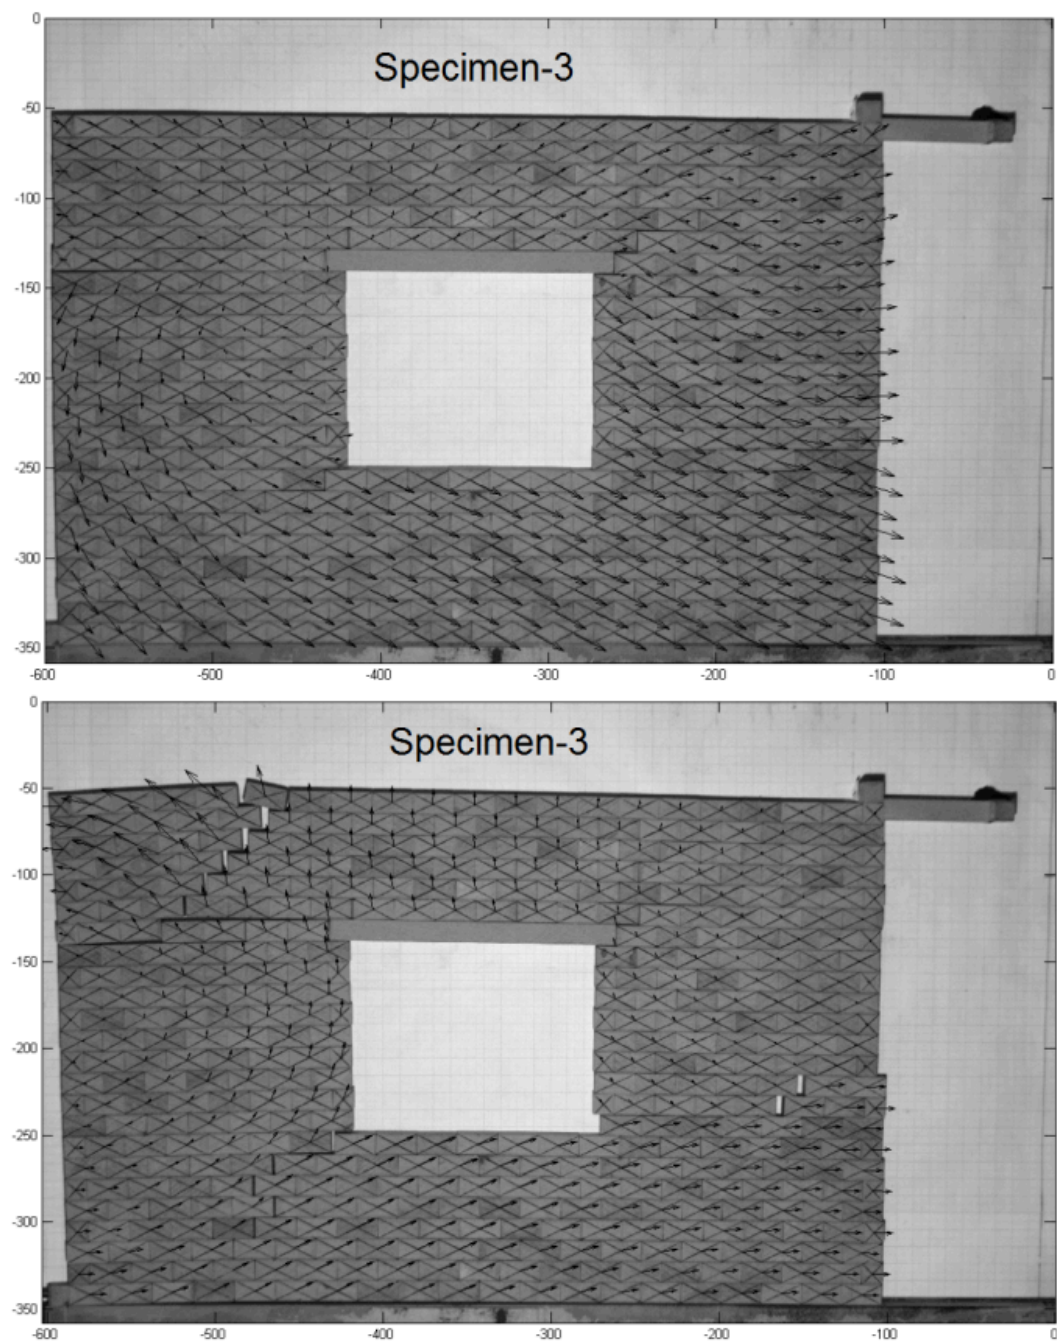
Displacement vectors for wall with opening specimen-3: Before (top), after (bot.) cracking
